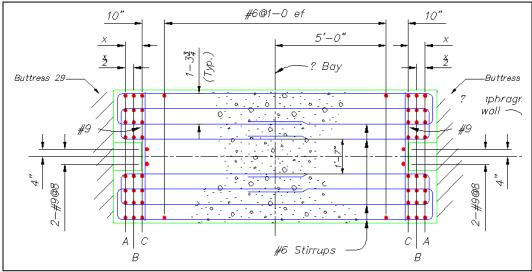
Plan view of reinforcing steel layout. Stony Gorge Dam Modification.
